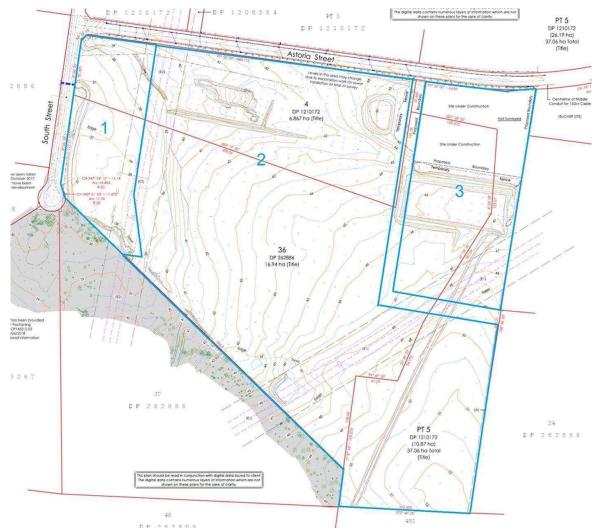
Preliminary Subdivision Plan (Source: Sydney Business Park)
